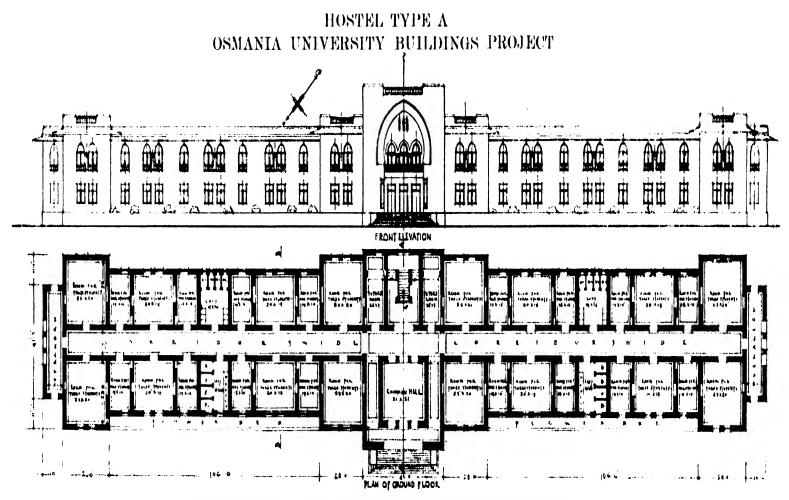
PLATE XX -Hostel A for 128 Students- Front Elevation and Ground Floor.
